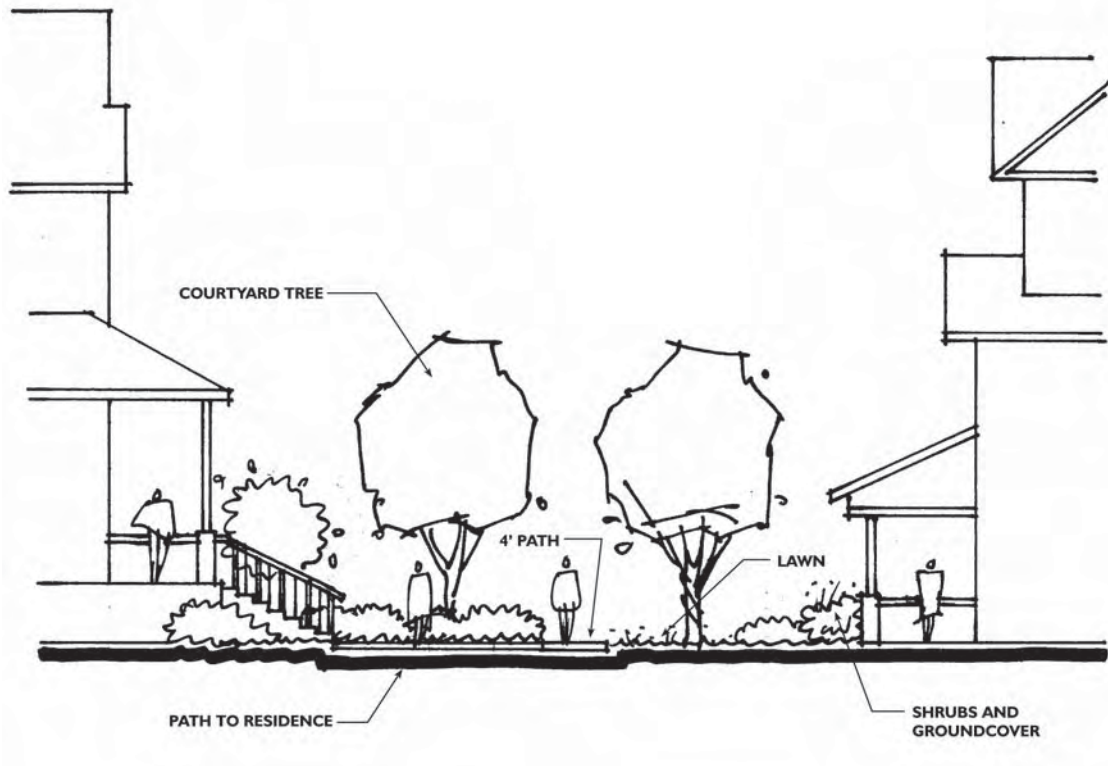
D.76: Illustrative Cross Section through Proposed Landscaped Paseo
